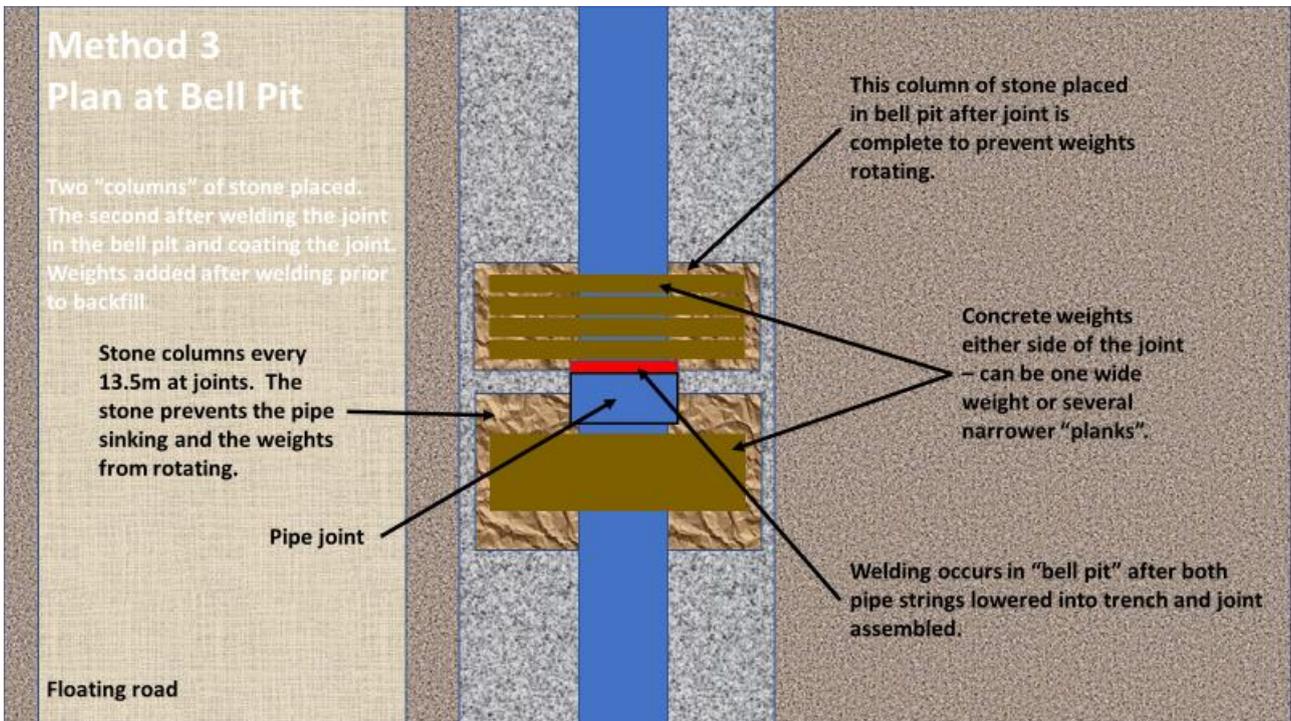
Method 3 Plan View of Joint at Bell Pit
